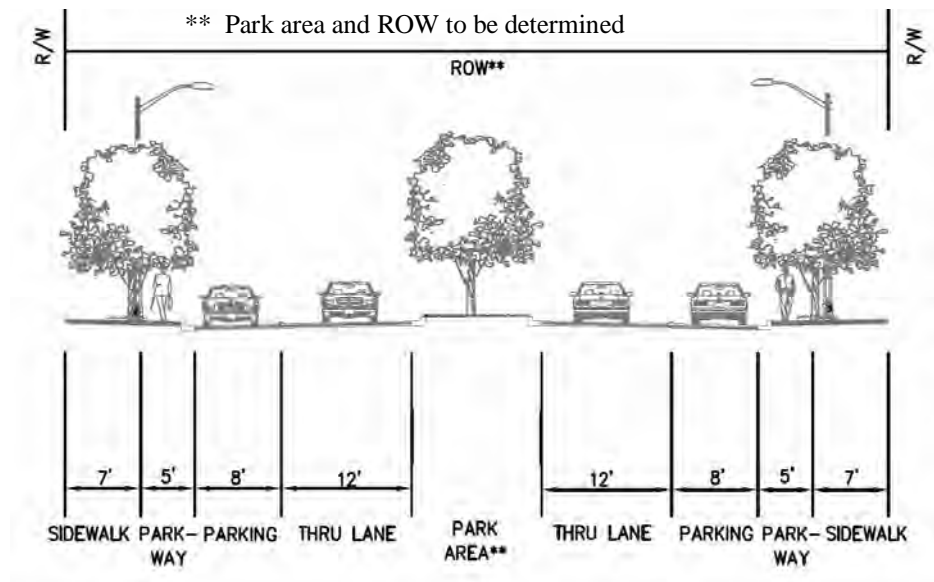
Proposed Cross Section, Entire Length of Woodlawn Avenue
